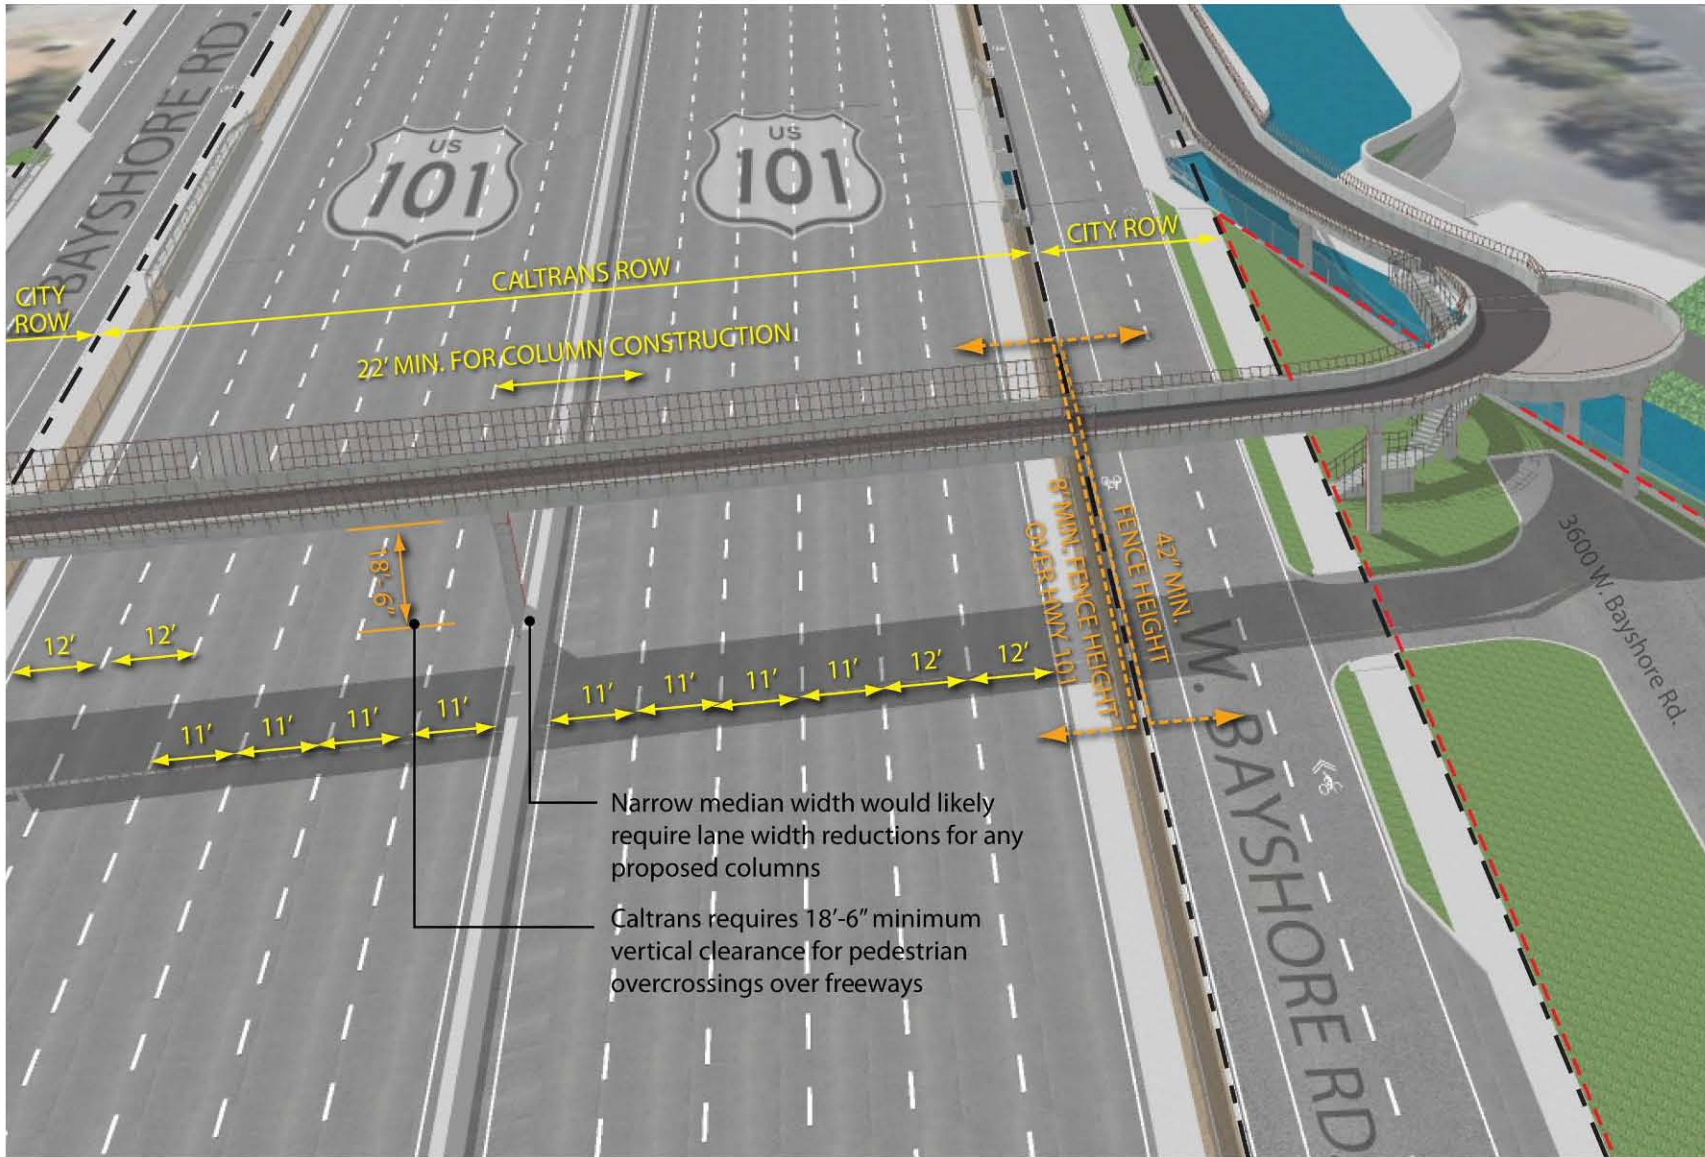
Bird's eye view of bridge main deck, looking 'south' along Highway 101
